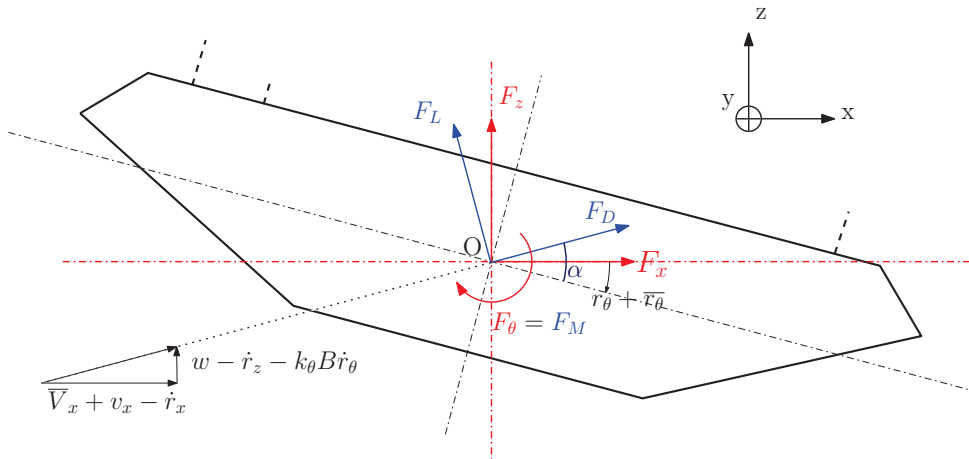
Cross-section of the bridge deck subjected to wind load.
